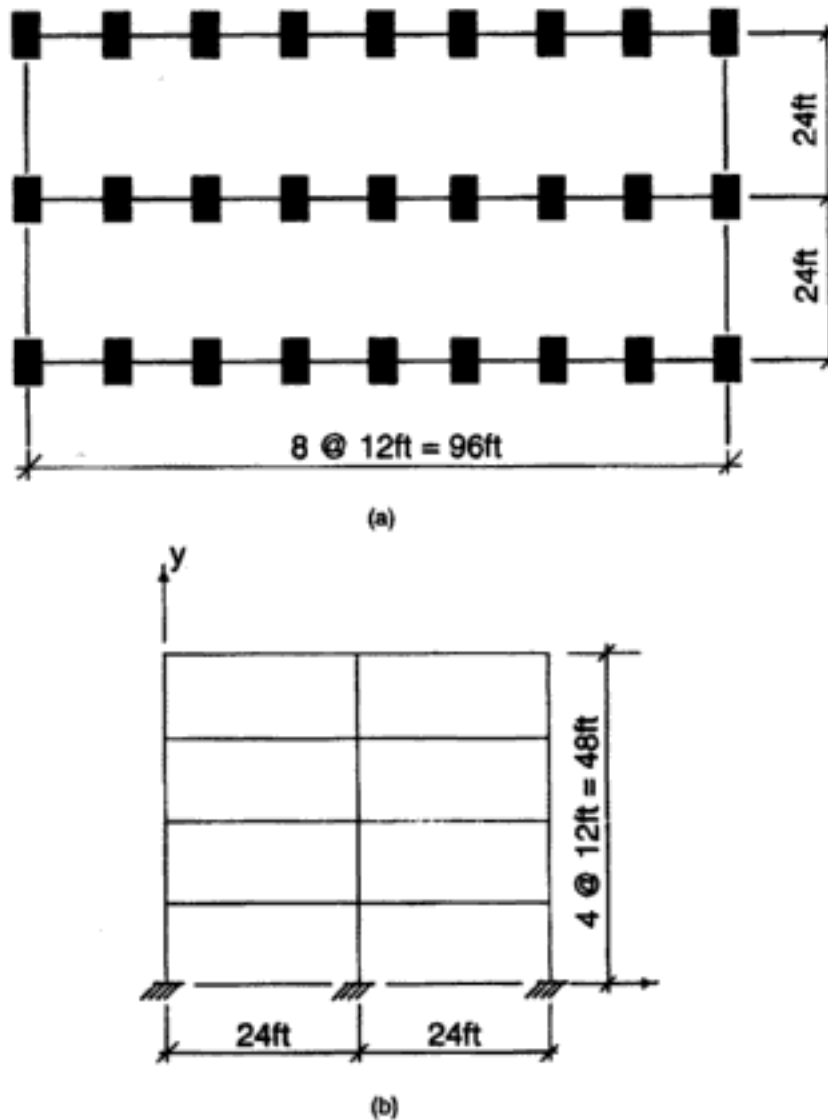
Plan and elevation for a four-story building for Example 21.3; (a) Plan. (b) Elevation.
